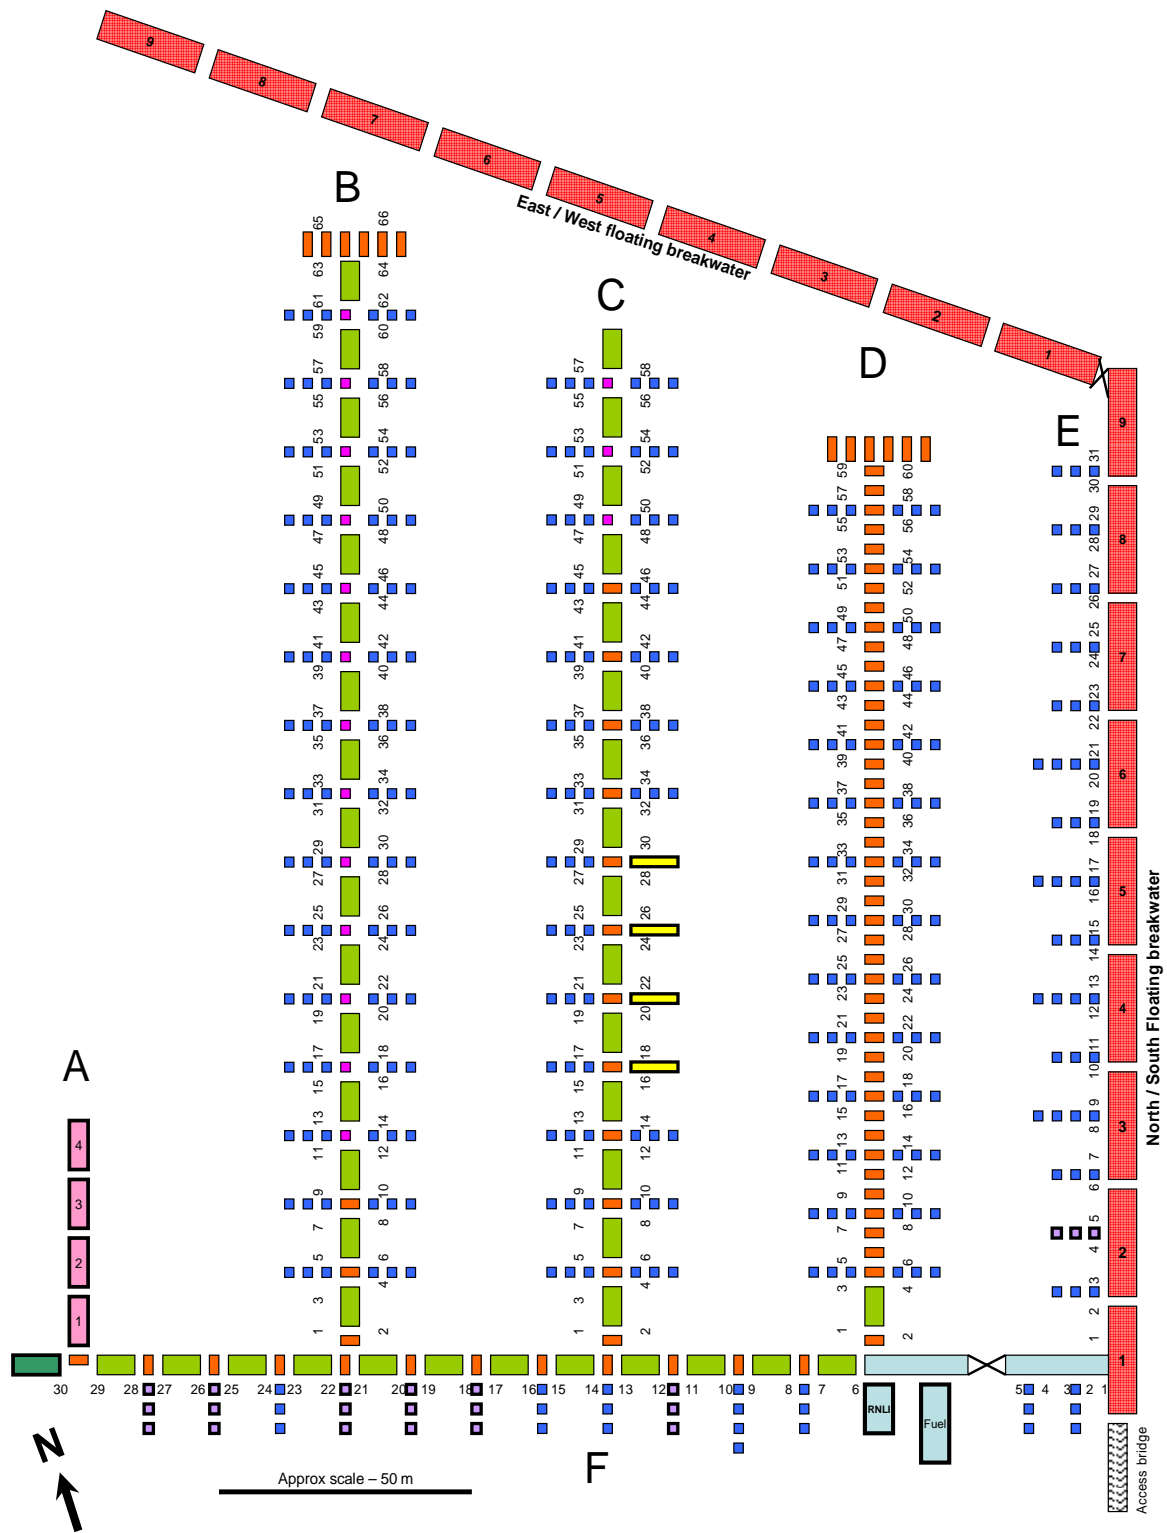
Holyhead Marina layout colour coded to pontoon types.
